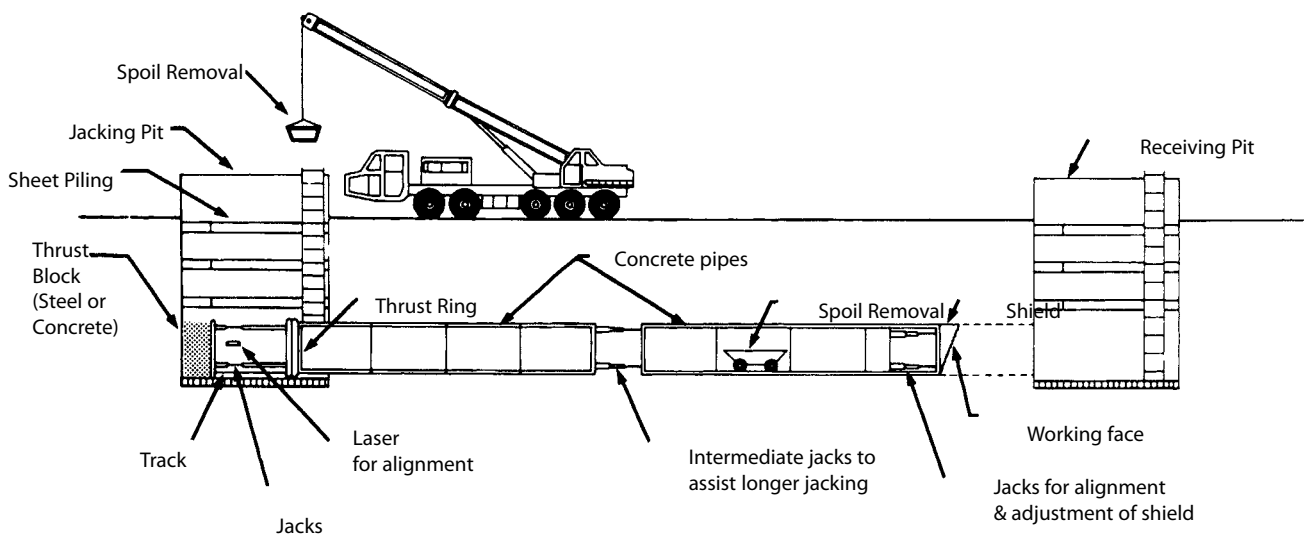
, Typical Pipe Jacking Set-Up (for pipes larger than 900 mm diameter)
